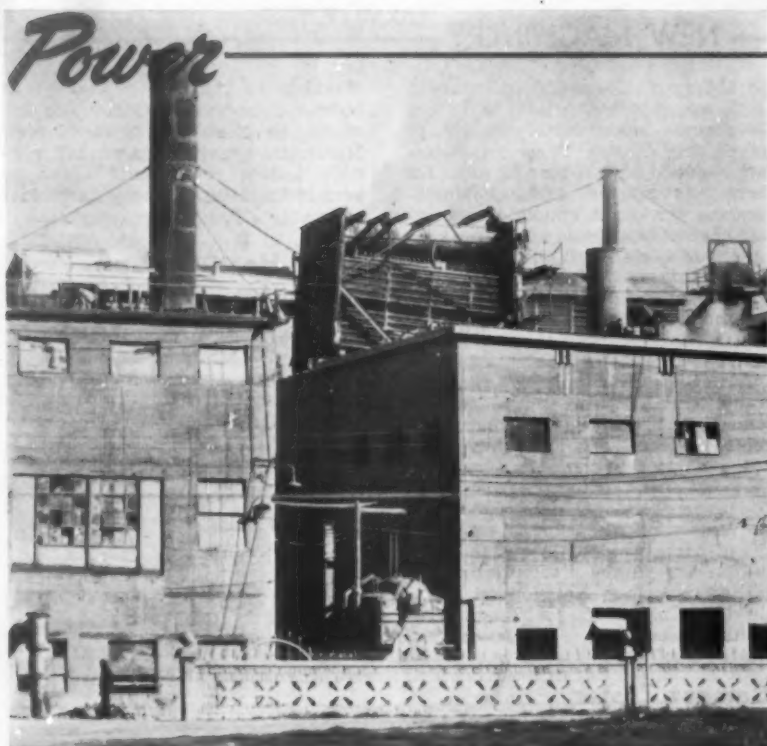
The boiler house, with No. 1 boiler removed and No. 2 boiler on cribbing
